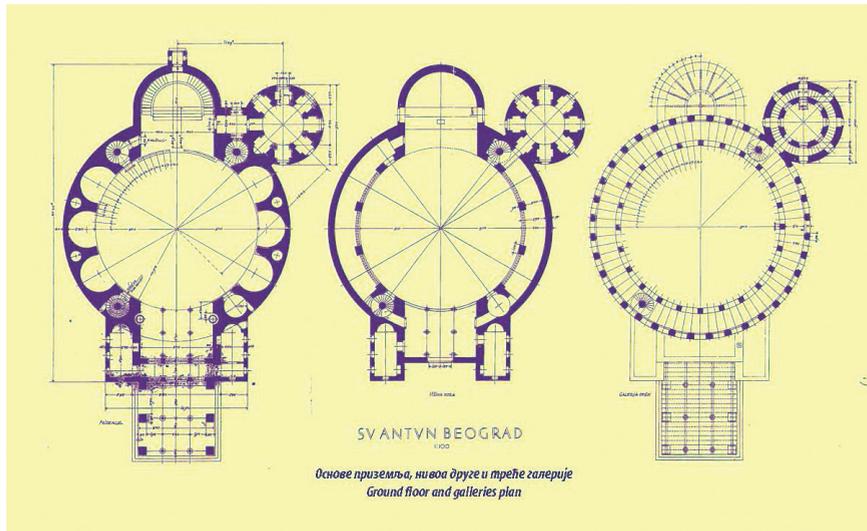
The Parish Church of Saint Anthony of Padua: Floor plan; a segment of the second project done by Jože Plečnik²¹
